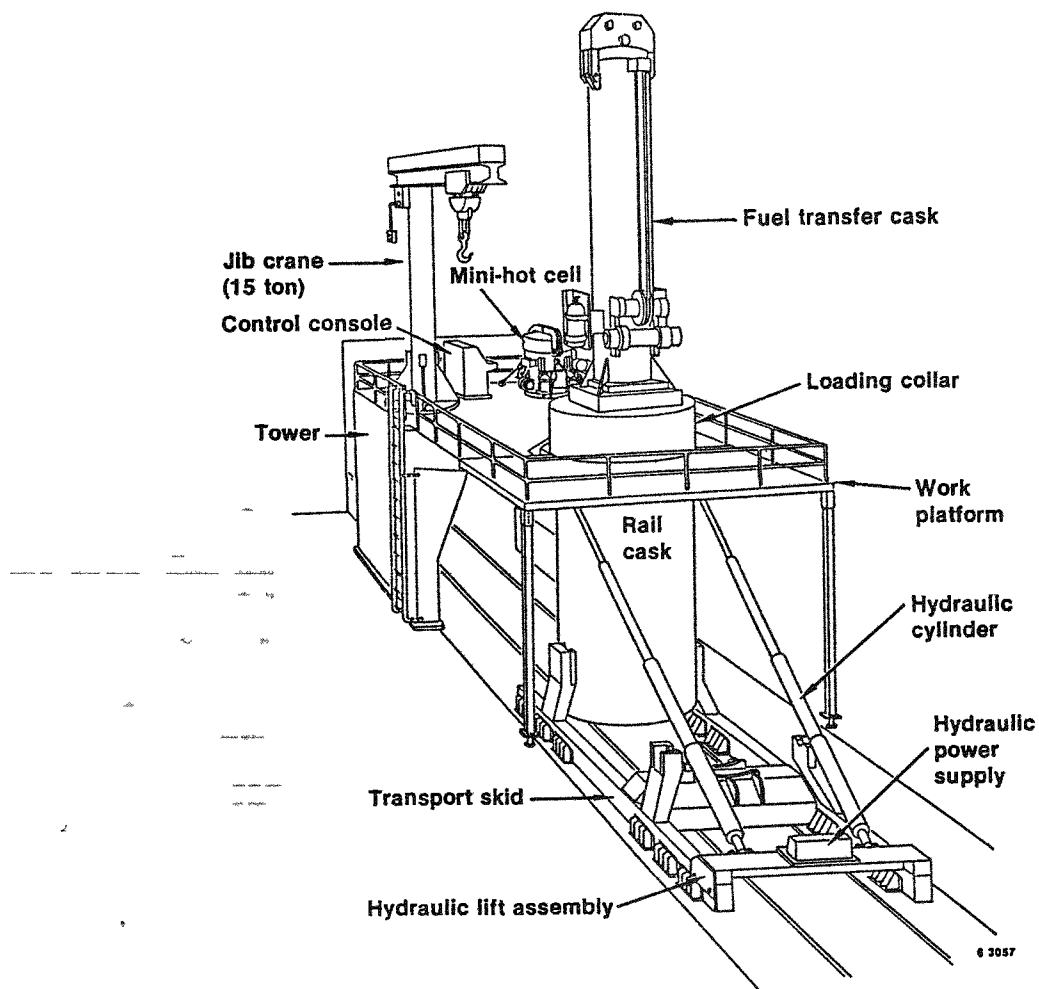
SCHEMATIC OF THE NUPAC 125-B RAIL CASK BEING LOADED WITH A CORE DEBRIS CANISTER AT TMI-2, USING THE SHIELDED FUEL TRANSFER CASK.
